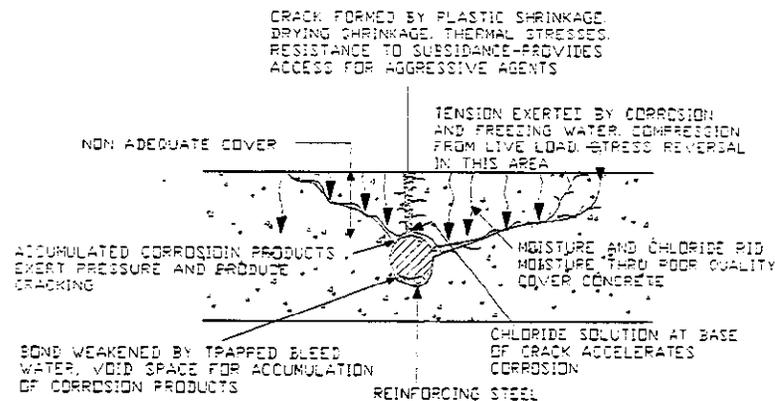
Possible causes of corrosion and spalling in bridge deck (Vaysburd 1993)
